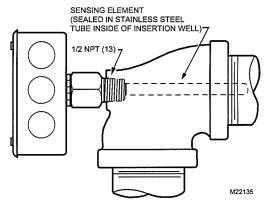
Method of mounting C7021D, C7023D, C7031D, C7041D Sensor.
